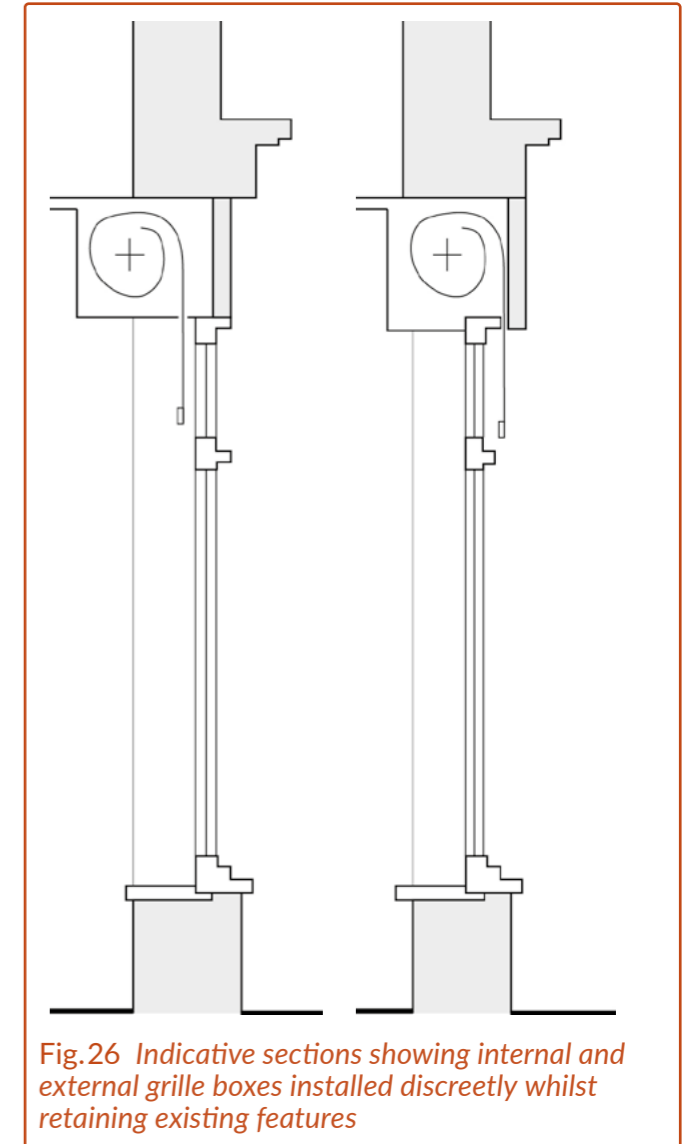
Indicative sections showing internal and external grille boxes installed discreetly whilst retaining existing features
